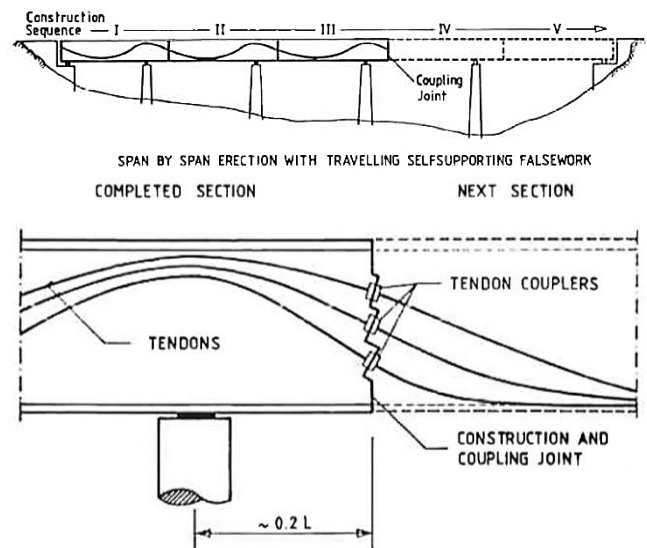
Section-by-section construction of a prestressed concrete bridge and a historical construction detail of a coupling joint, [4].
